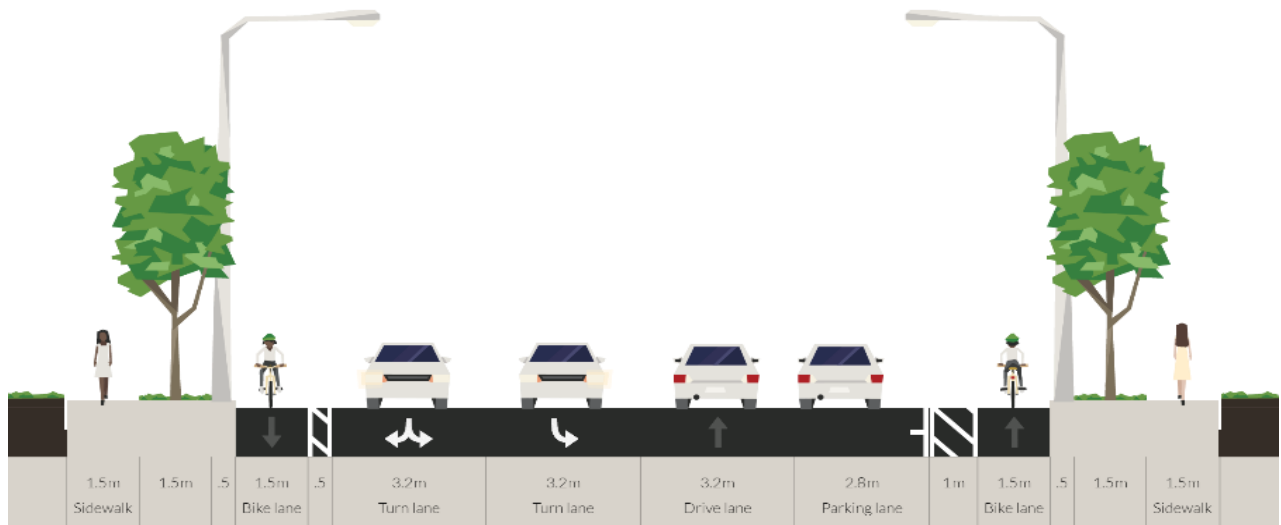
Existing Cross-section of Doris Ave. at Sheppard Ave. E (Looking North)
